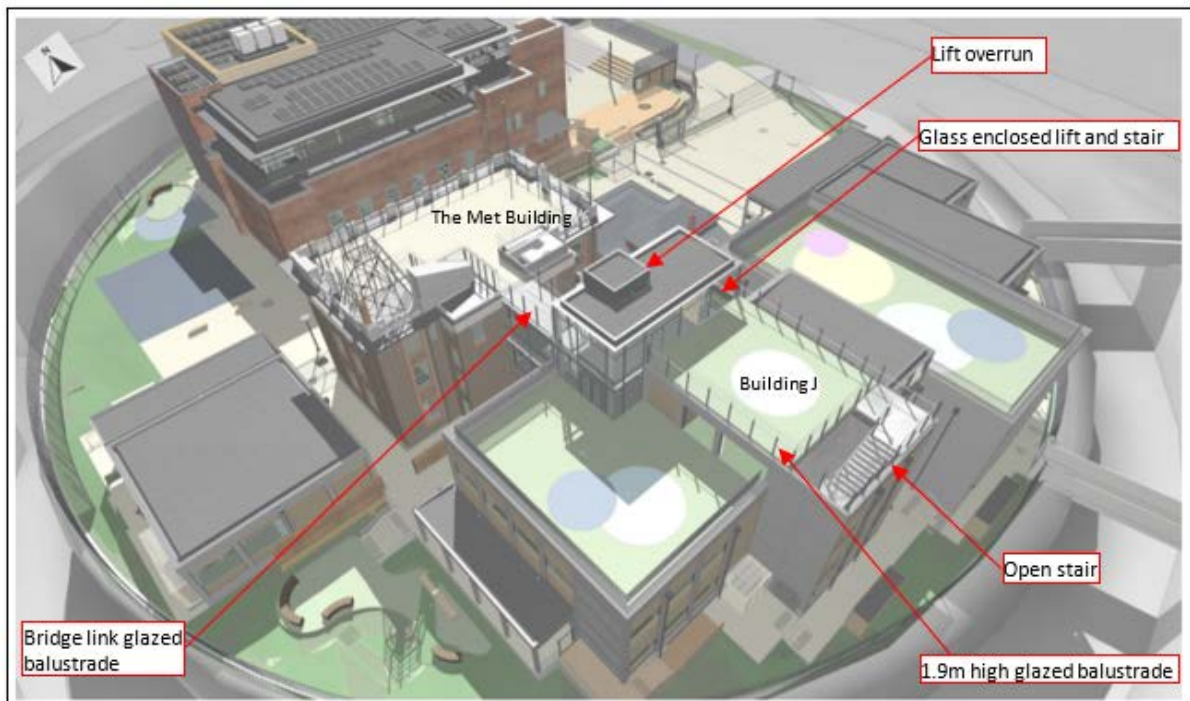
| Building J revised rooftop (Source: SRtS 2021)
